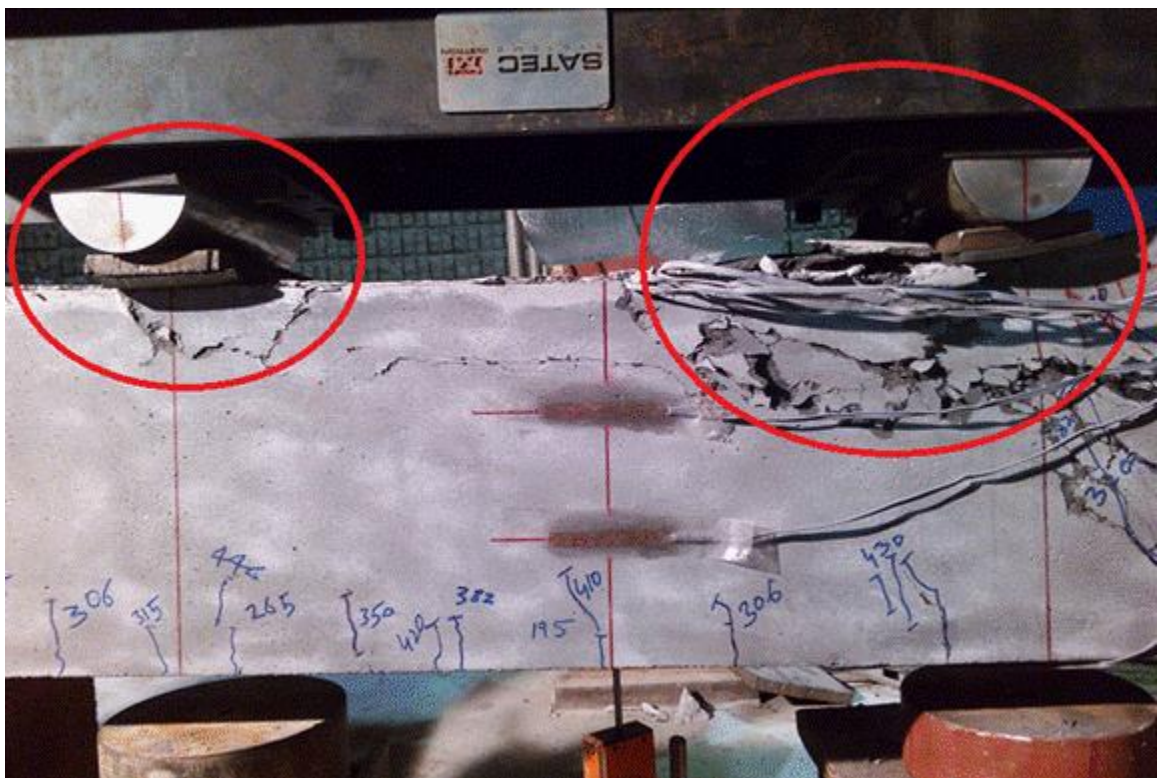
Unloaded post-failure deformed configuration of SB-3.1-UMSN, showing heavy bearing damage.
